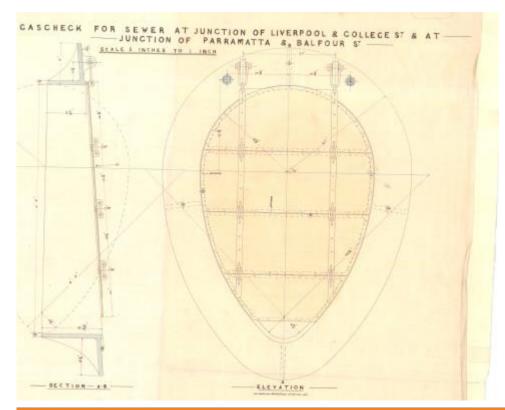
Example crosssection of BOOS at junction of Liverpool Street and College Street and at intersection of Parramatta Road and Balfour Street (from Sydney Water archival plan 0157224)
